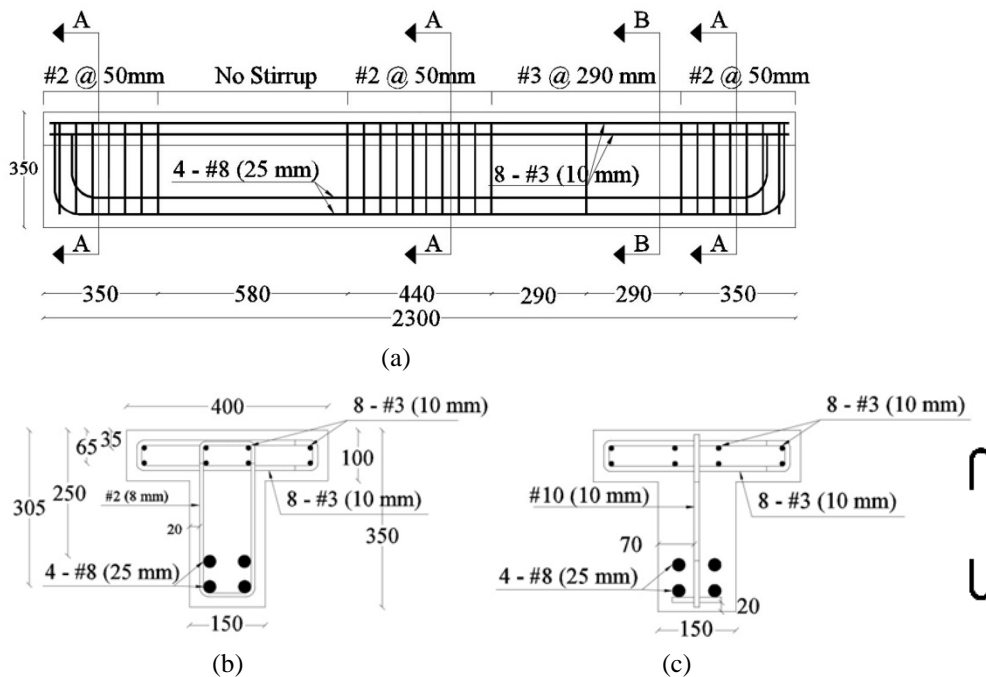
Schematic drawing and dimensions of the test specimens; a) typical dimensions and steel distribution along the beam, b) section (A-A) and c) section (B-B).
